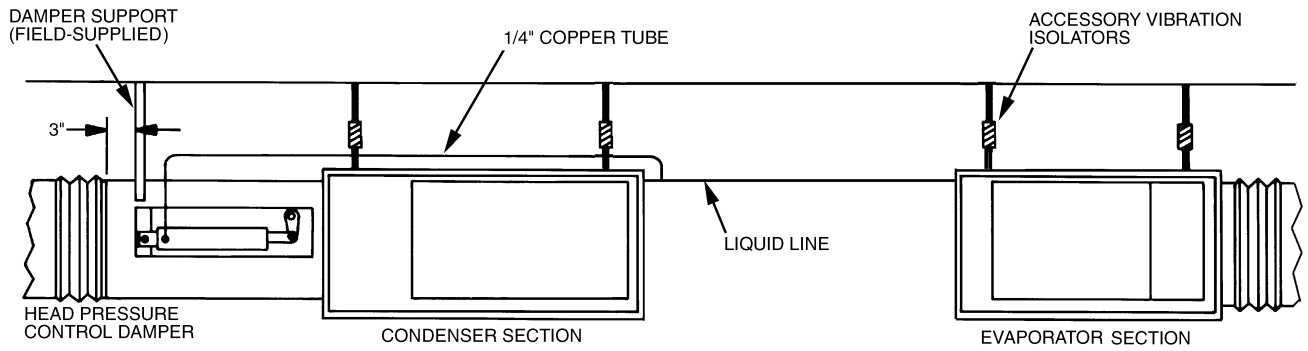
Head Pressure Control Damper Installation — Split Configuration
